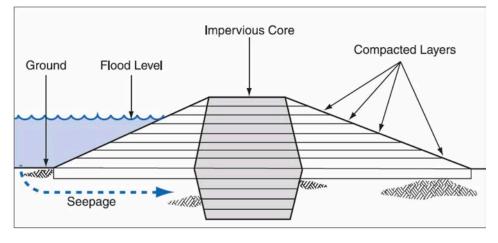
Levees constructed with compacted layers of soil and an impervious core (FEMA, 2009)
